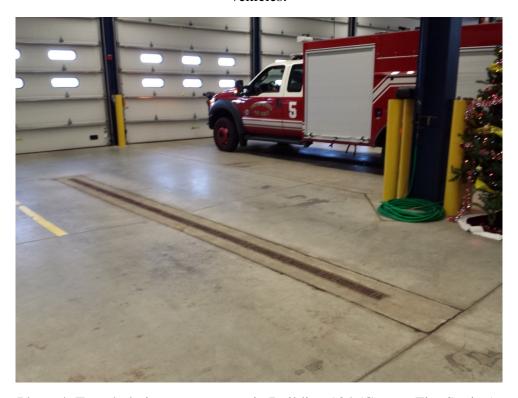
Trench drains were present in Building 104 (Current Fire Station).
